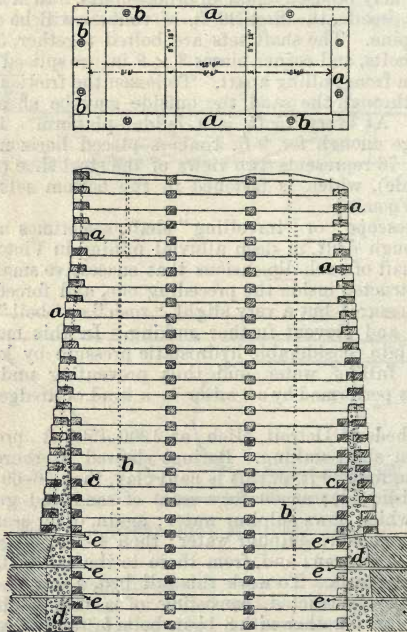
CEMENT AND TIMBER CRIBBING.
